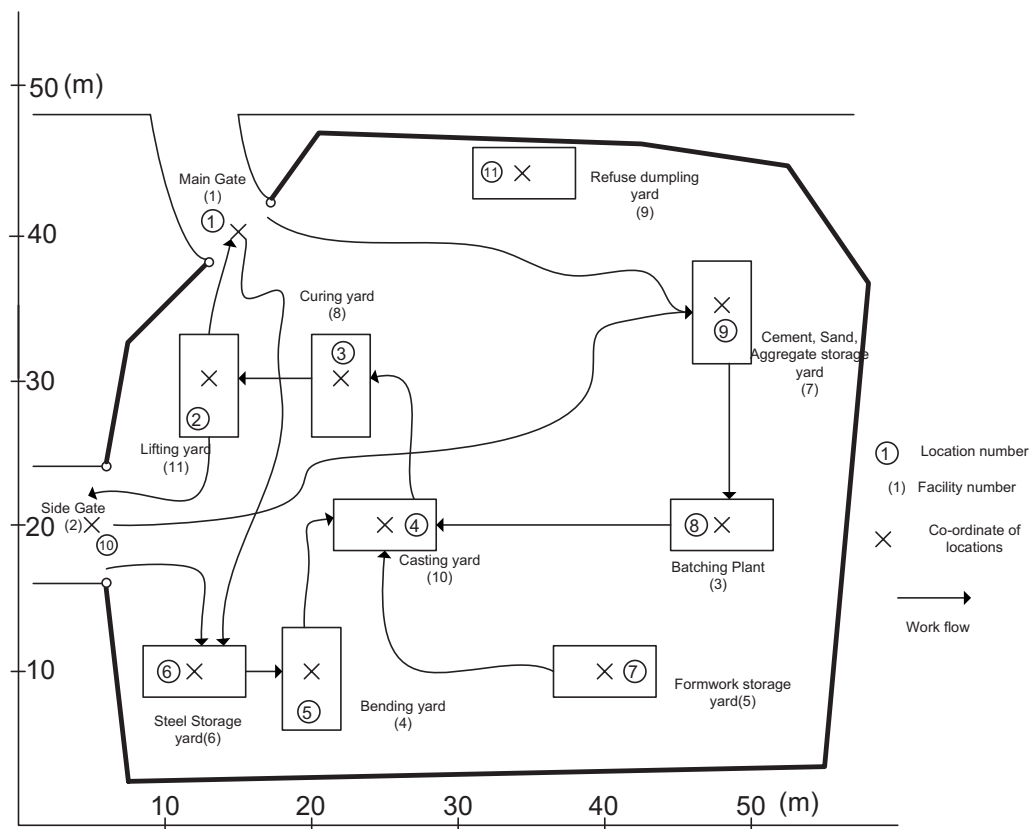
Site precast yard layout arrangement plan for the MIP
